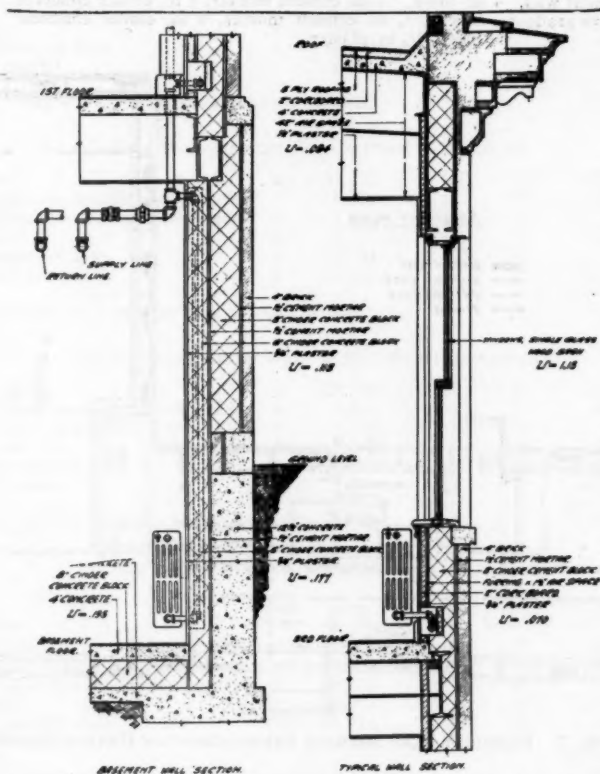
TYPICAL CROSS SECTIONS SHOWING BUILDING WALL CONSTRUCTION
